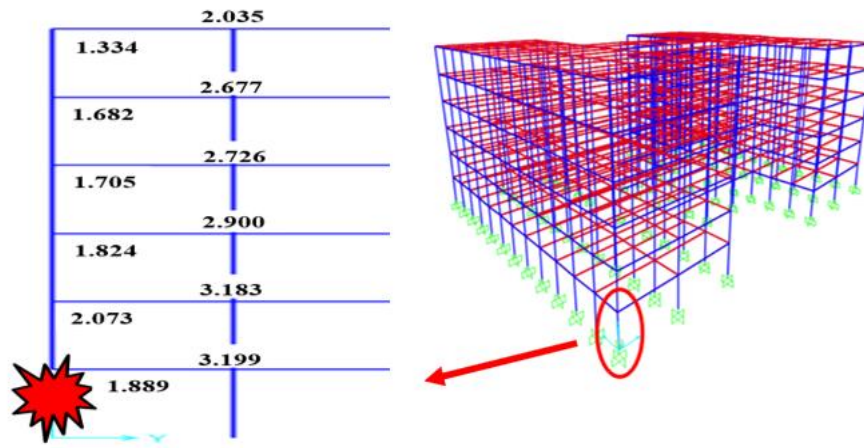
DCR of beam sections in Y-Z plane after removing Corner Column C159 (case 3)
